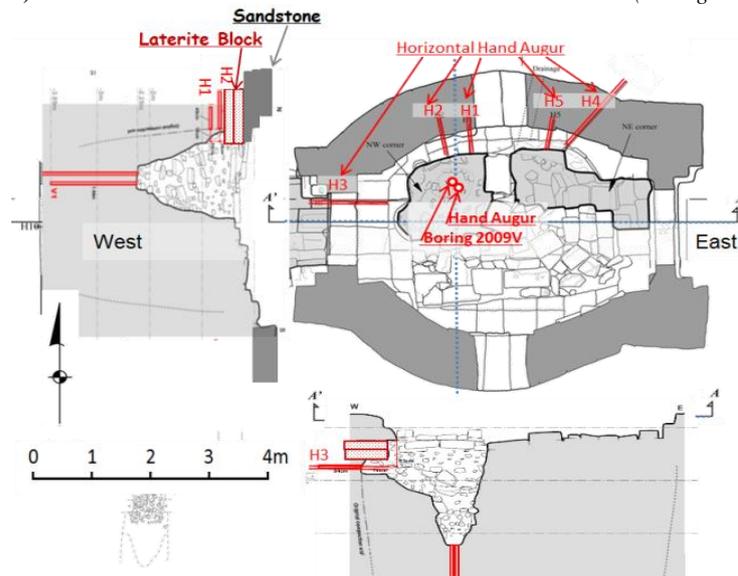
Excavation beneath the base stones of the main tower of Bayon temple
